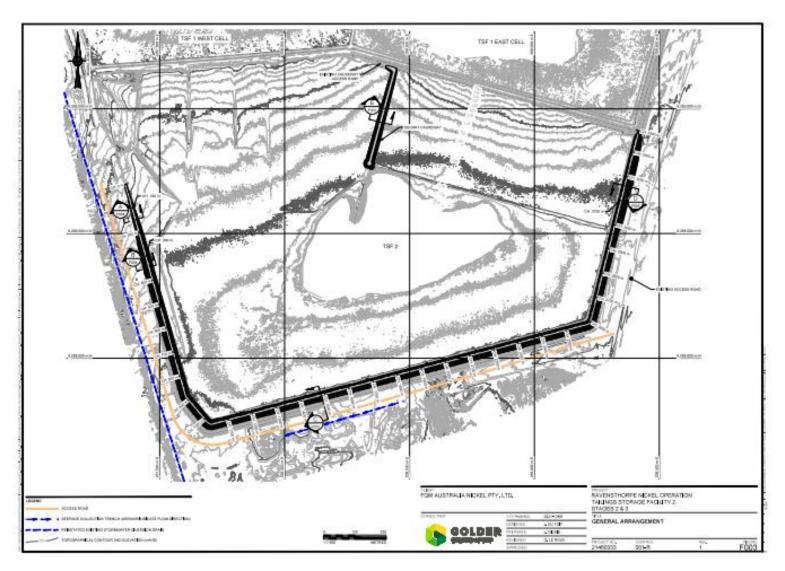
Stormwater and Seepage Management Infrastructure Plan
